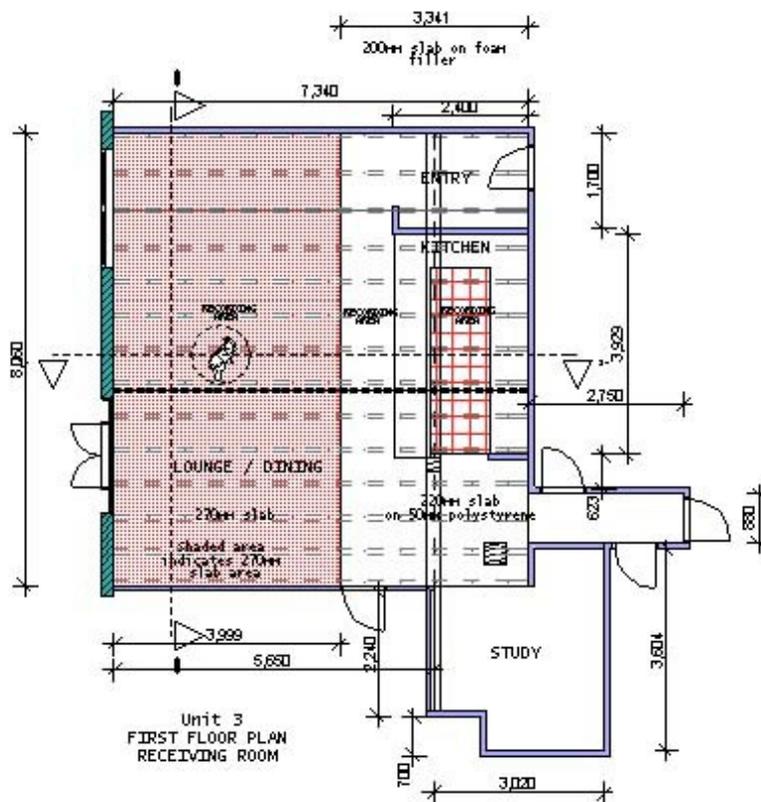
FLOOR PLAN - RECEIVING ROOM
